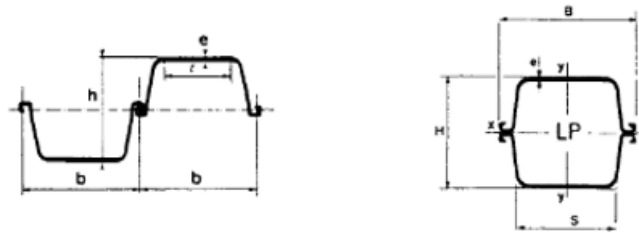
The cross sections of test sheet pile and box pile (Bustamante and Gianceselli, 1991).
